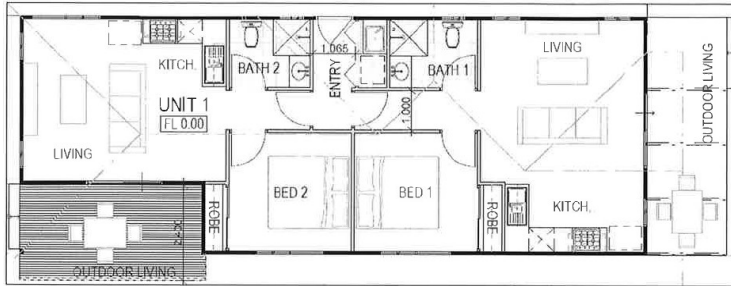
An example of a layout which has common laundry facilities but the form and function is two separate dwelling units. This would be classed as, two grouped dwellings, single house with ancillary dwelling, or multiple dwelling if they were constructed above or below another dwelling.
